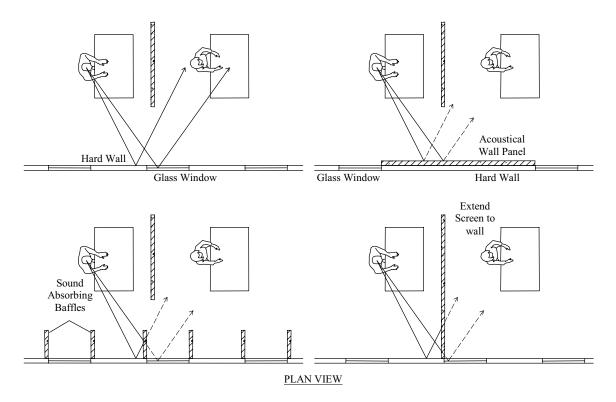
Walls, doors, windows and curtain walls can reflect sound into adjacent workstations.
